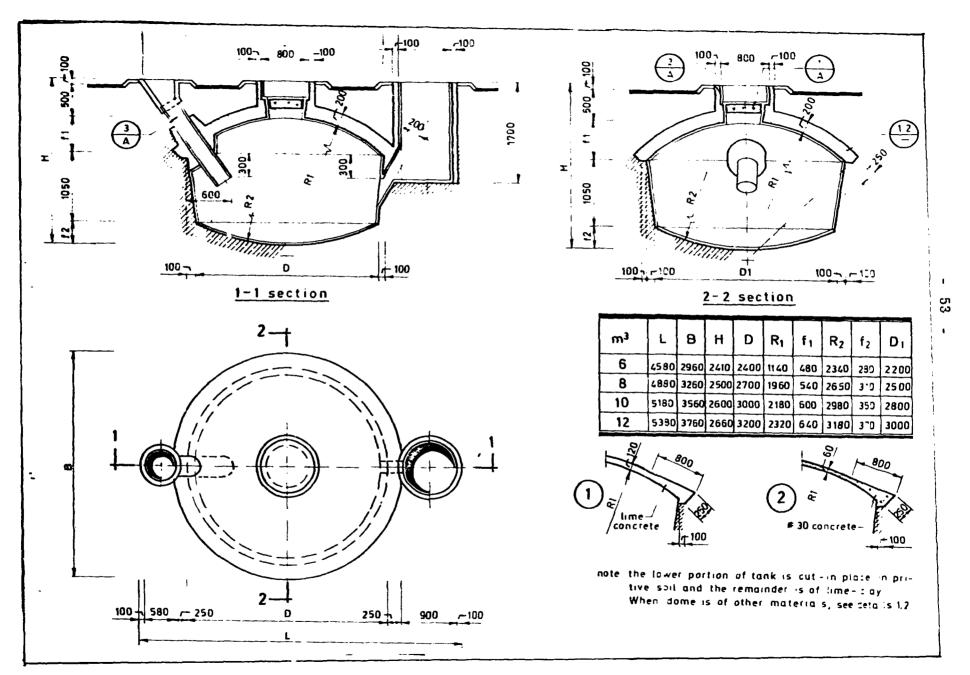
Design of Cut-in Place Biogas Unit with a Cast Concrete Dome
